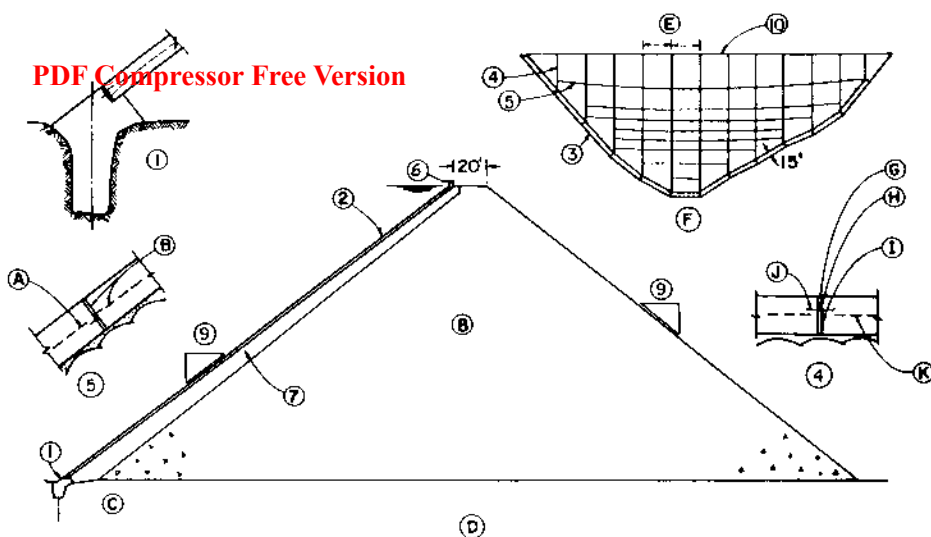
Features of early concrete face rockfill dam design (ICOLD 1989a). (1) Cutoff trench, (2) Concrete face, (3) Toe slab, (4) Vertical joint, (5) Horizontal joint, (6) Parapet, (7) Cranc-placed large rock, (8) Dumped rockfill, (9) Slope, (10) Curved axis. (A) Reinforcement, (B) 1.9 cm redwood filler and Z waterstop, (C) Grout curtain, (D) Cross section of dam, (E) 18 m (60 feet), (F) Elevation of face, (G) Mastic, (H) Premolded asphalt, (I) Compressible joint filler, (J) U copper, (K) Reinforcement.
